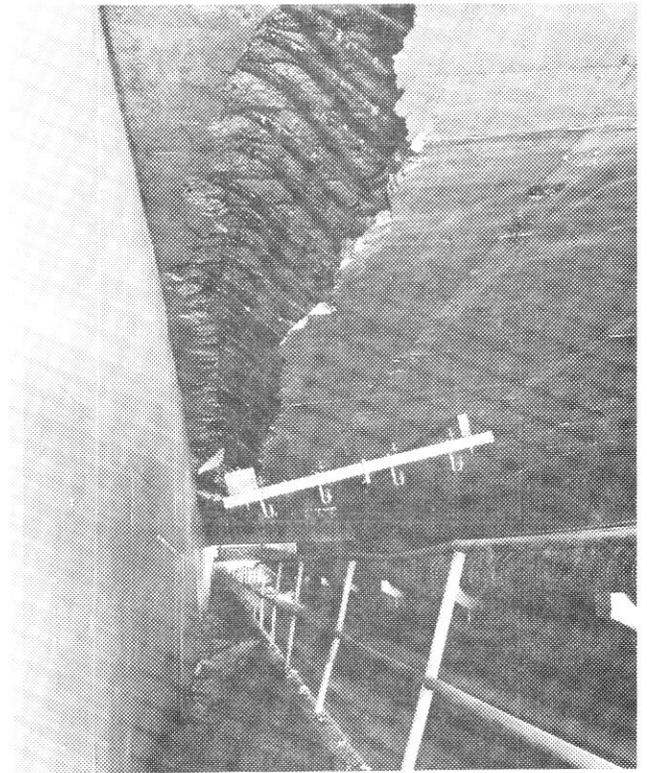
Settlement of abutment backfill at northerly end of Bridge 53c-316.
